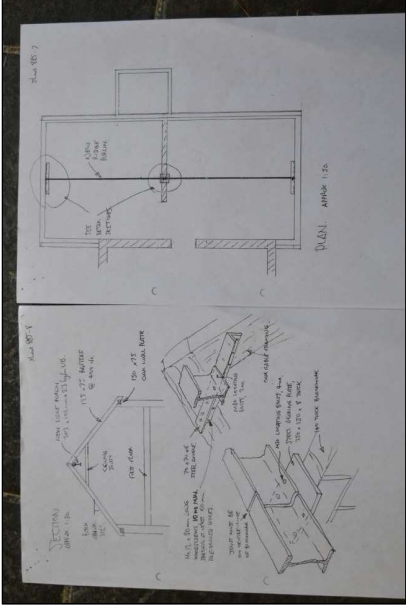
Drawing from 2004 showing plan of steel beam layout (CPAT 4900-0056)
